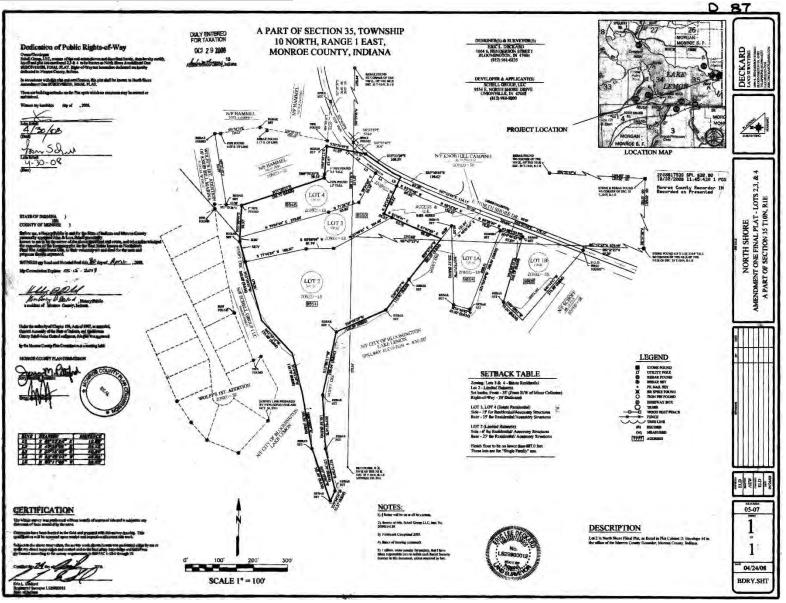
North Shore Subdivision Improvement Agreement
